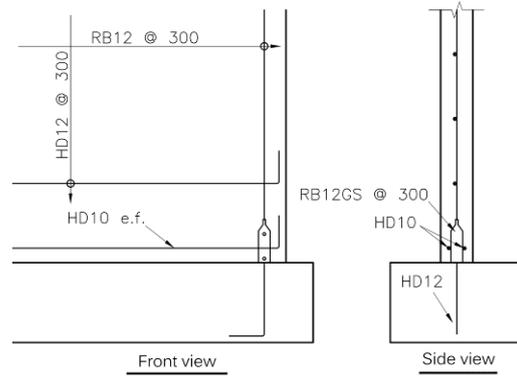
An example of SESOC recommended detailing for metal duct connections.
